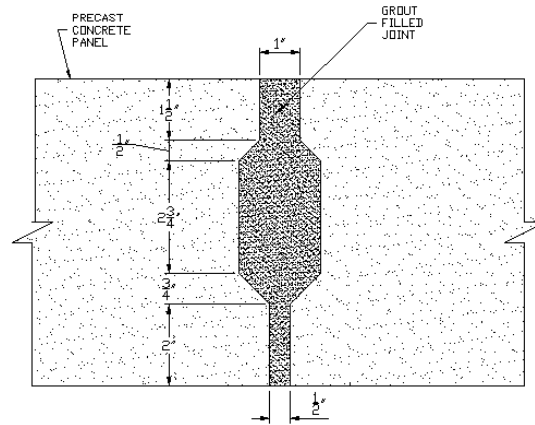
Detail of a typical female-to-female type shear key joint (Issa et al. 1995b)
